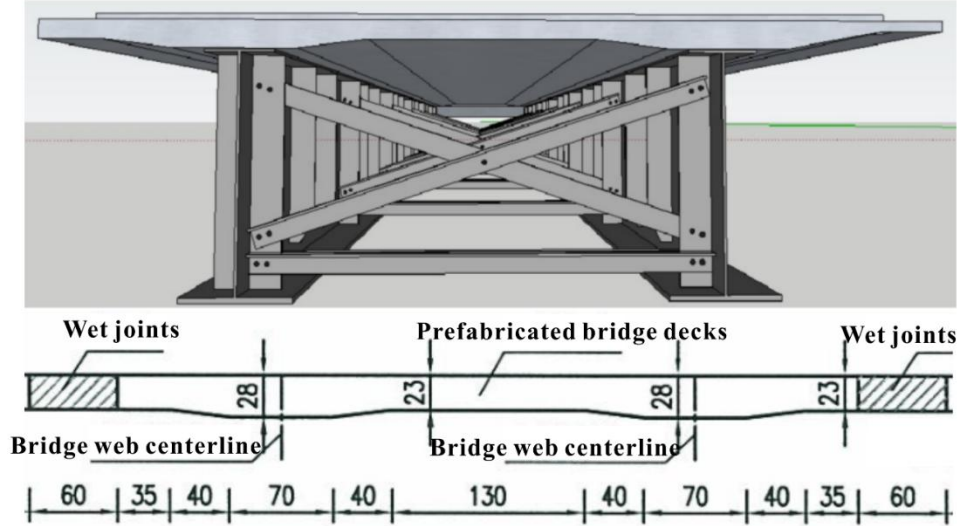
Schematic diagram of the combined girder bridge model and dimensions of the concrete panels in the span.
